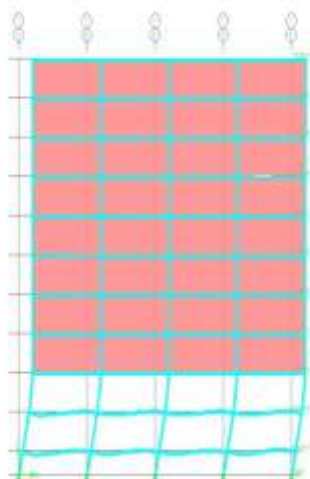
Model 6: G+10 RC three soft storey building with slab element lateral displacement
